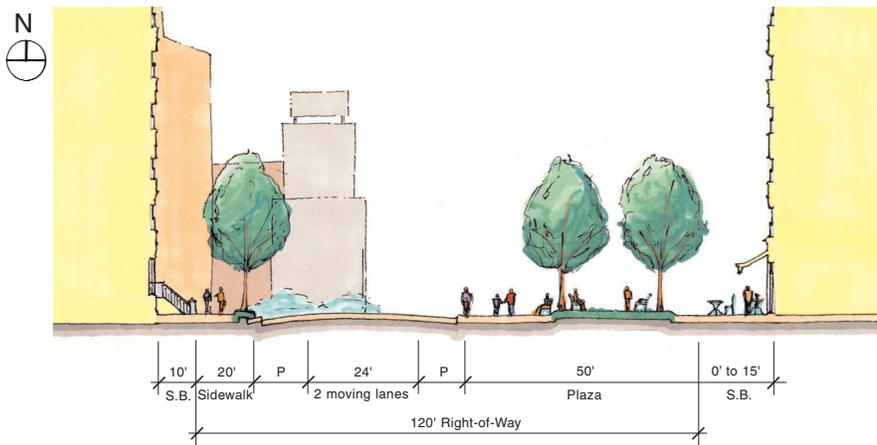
Cross Section of Proposed Chicago Avenue Extension
